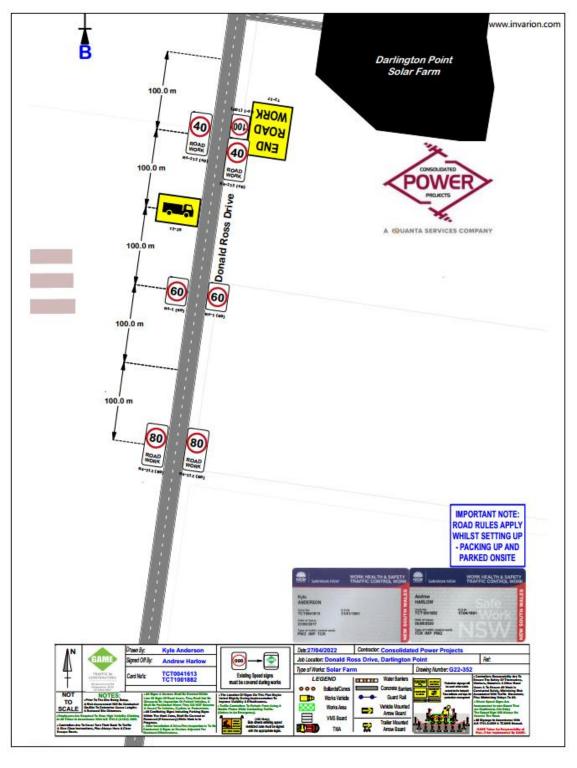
TRAFFIC CONTROL PLAN (DONALD ROSS DRIVE (SOUTH)
